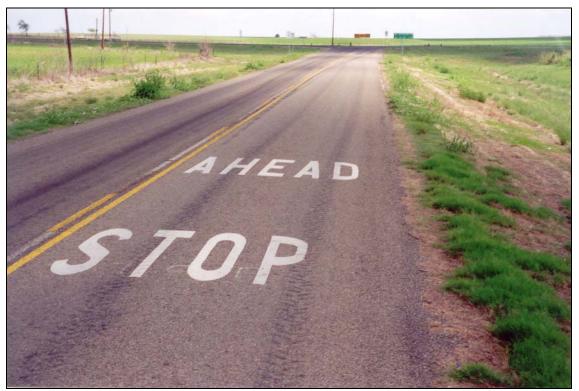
Advance Warning Pavement Markings on Intersection Approach.
